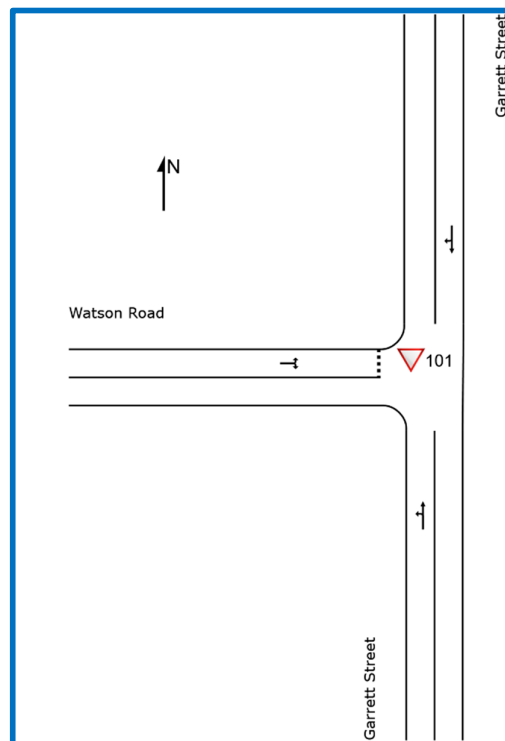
Priority Intersection of Garrett Street with Watson Road (SIDRA)
